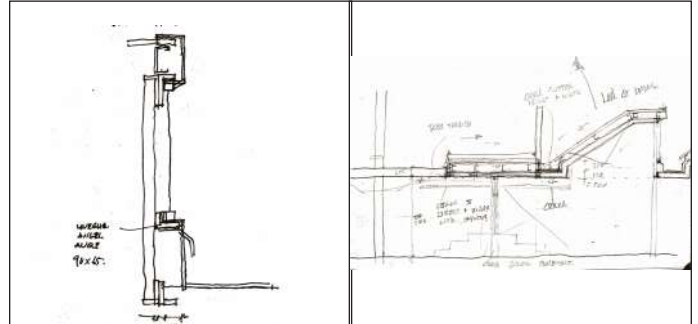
Multipurpose sports centre glazing and beam connection detailing (Author: 2019)
